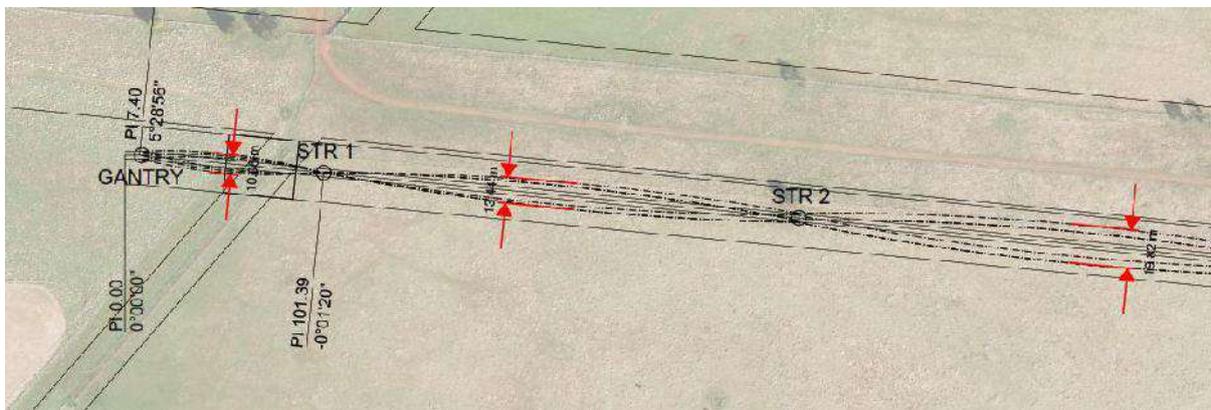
Extract of Appendix C indicating in red the maximum sway (m) of each string
